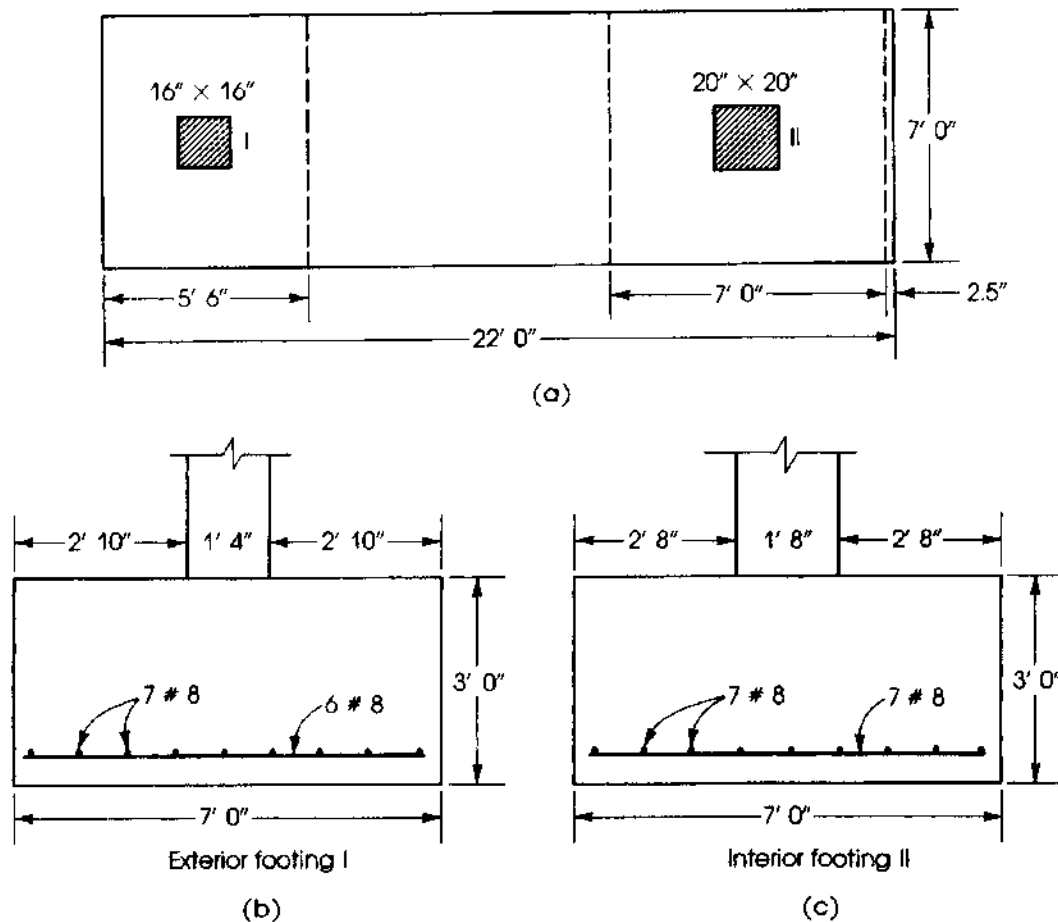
Design of combined footing, transverse direction: (a) plan, (b) exterior footing, and (c) interior footing.
